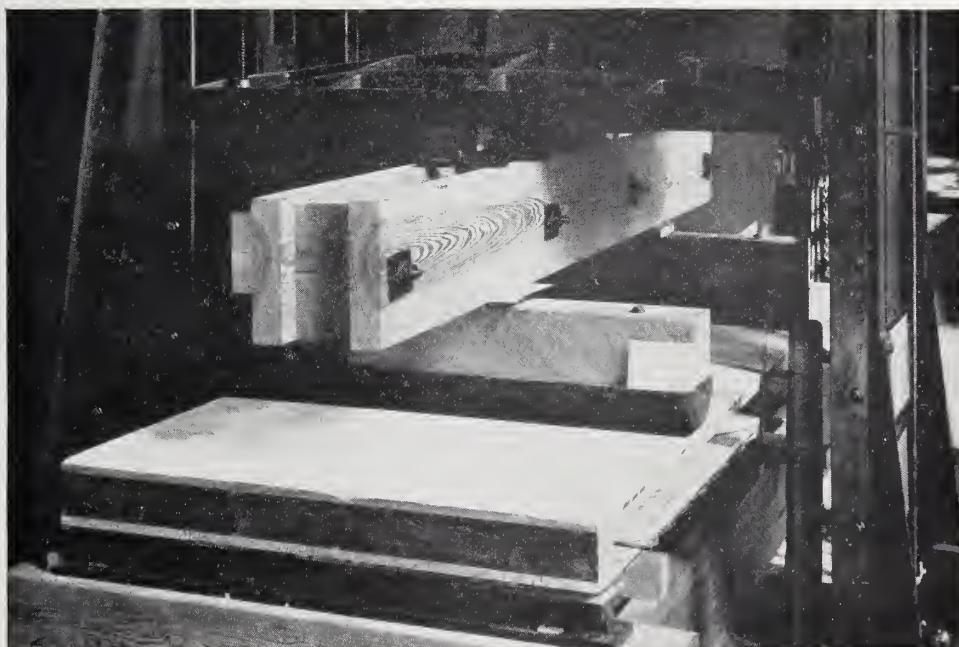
Wall specimen QA-T1 in position for transverse-load test.
